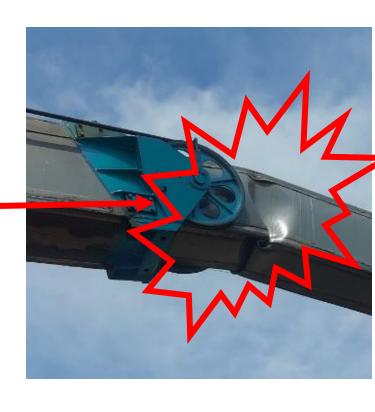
IMPROPER EXTENSION BOOM DEPLOYMENT
